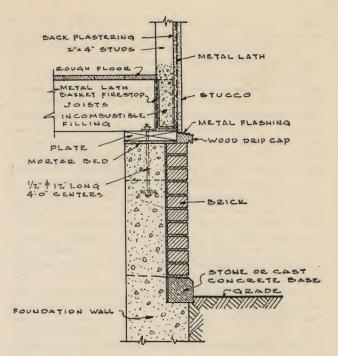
Sill Construction, Balloon Frame, Joists Resting on Wood Sills.
